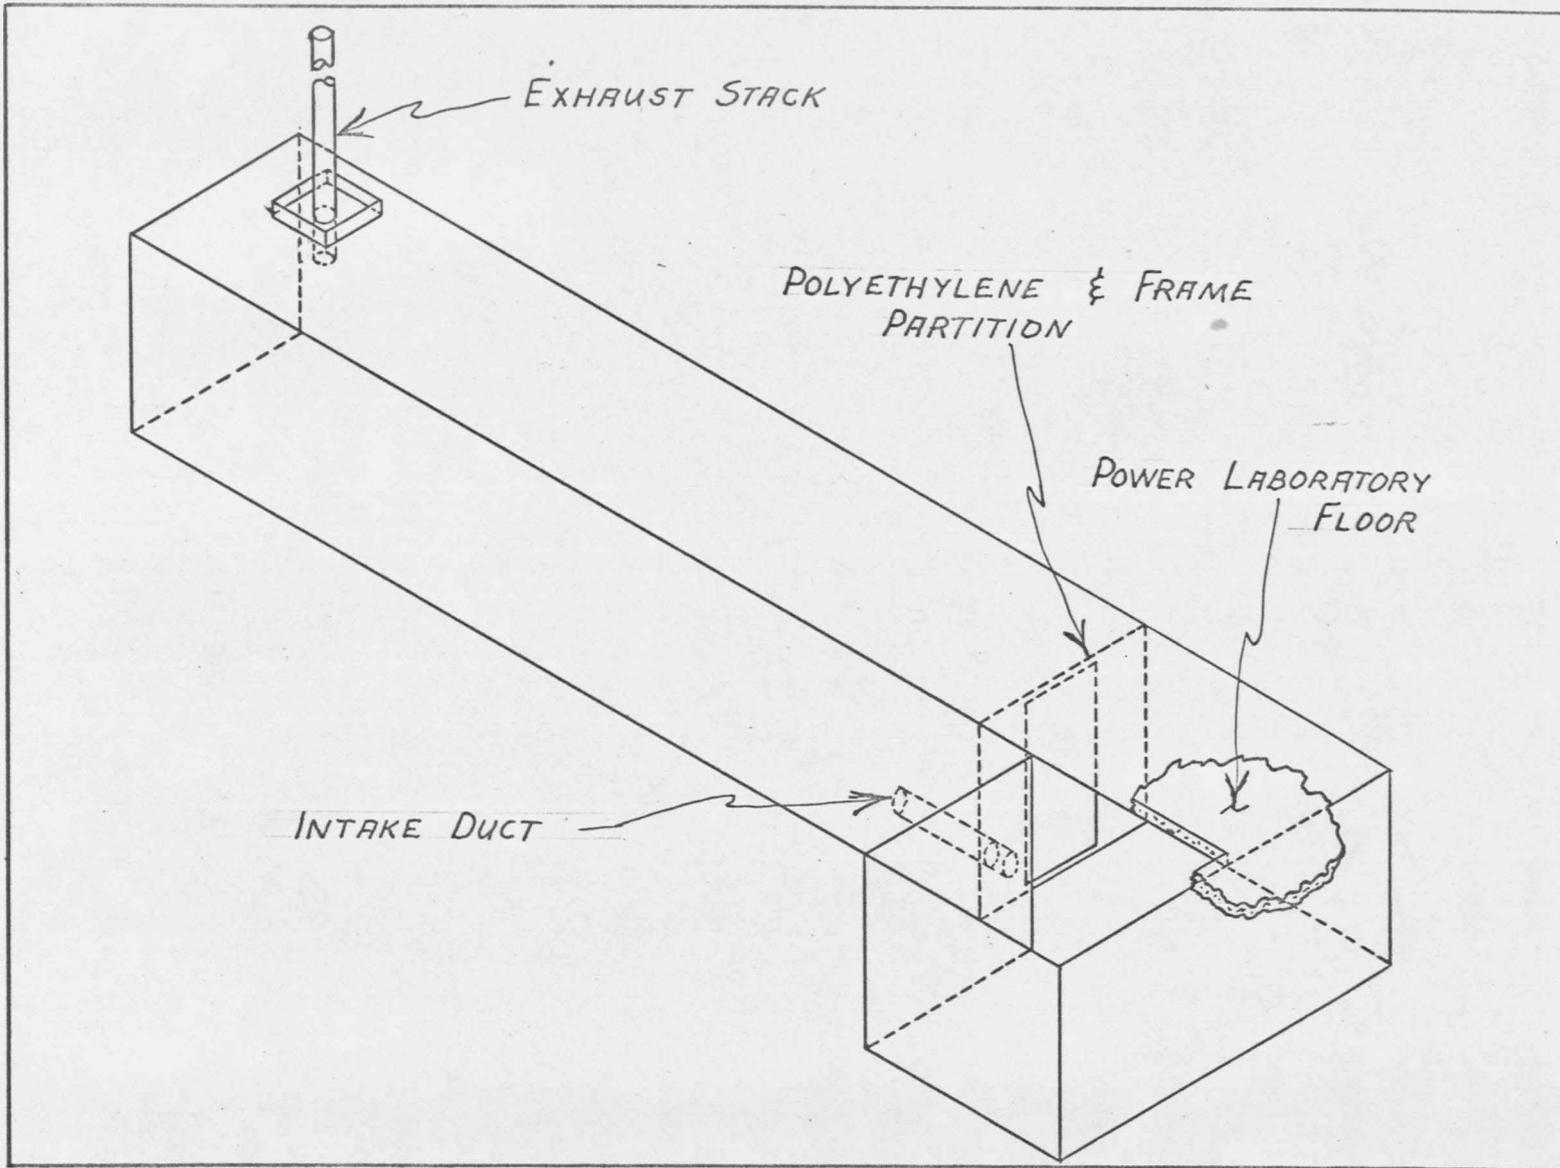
FALLOUT SHELTER TEST FACILITY
